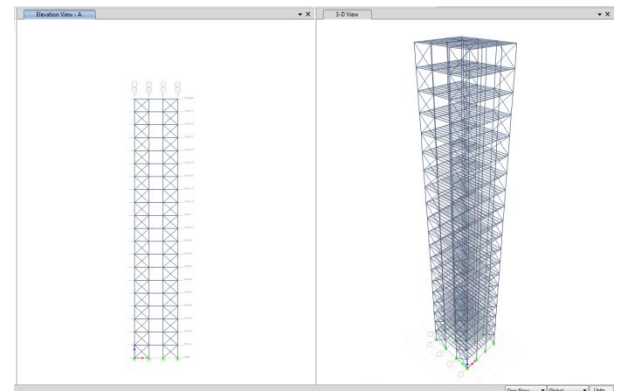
Elevation and 3D view of the building with X bracings at outer bays.
